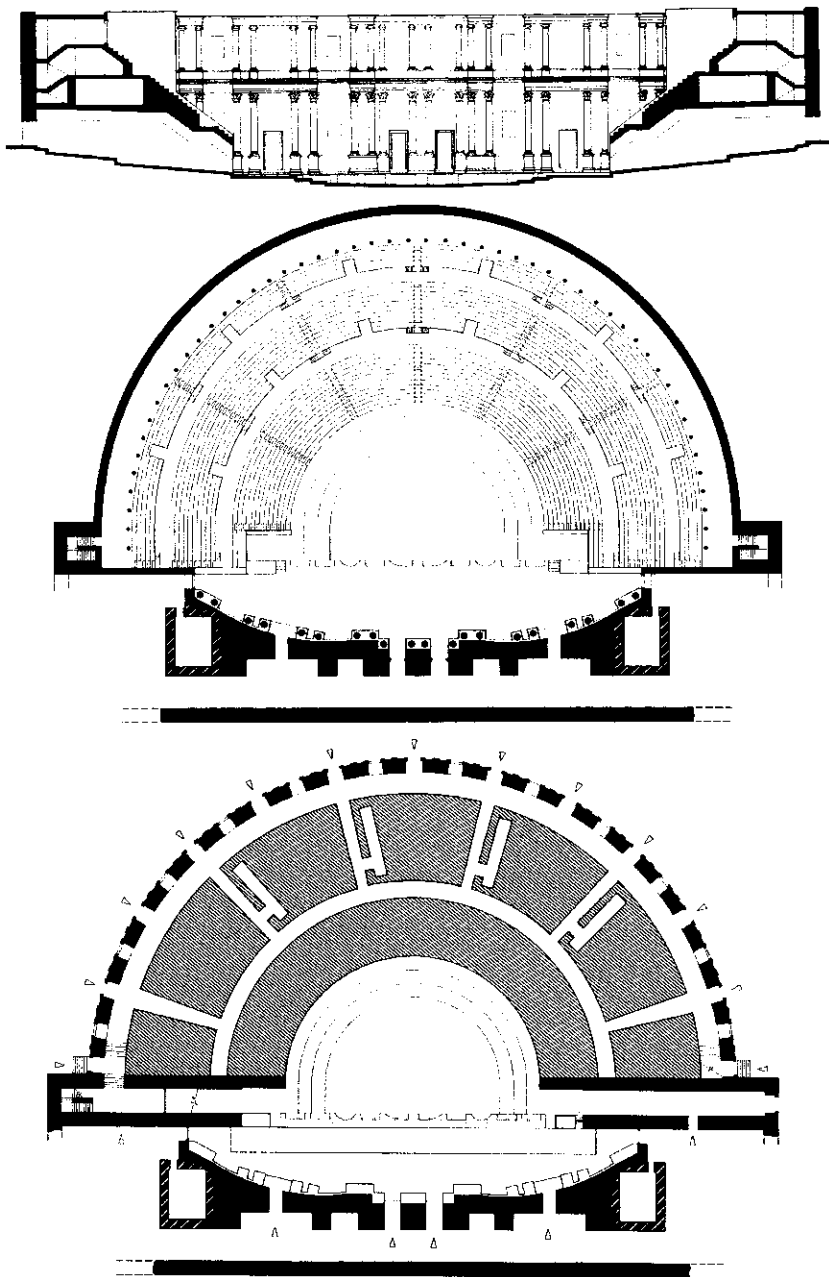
Caesarea, plan of the theater (reconstruction by Rachel Laureys-Chachy).
